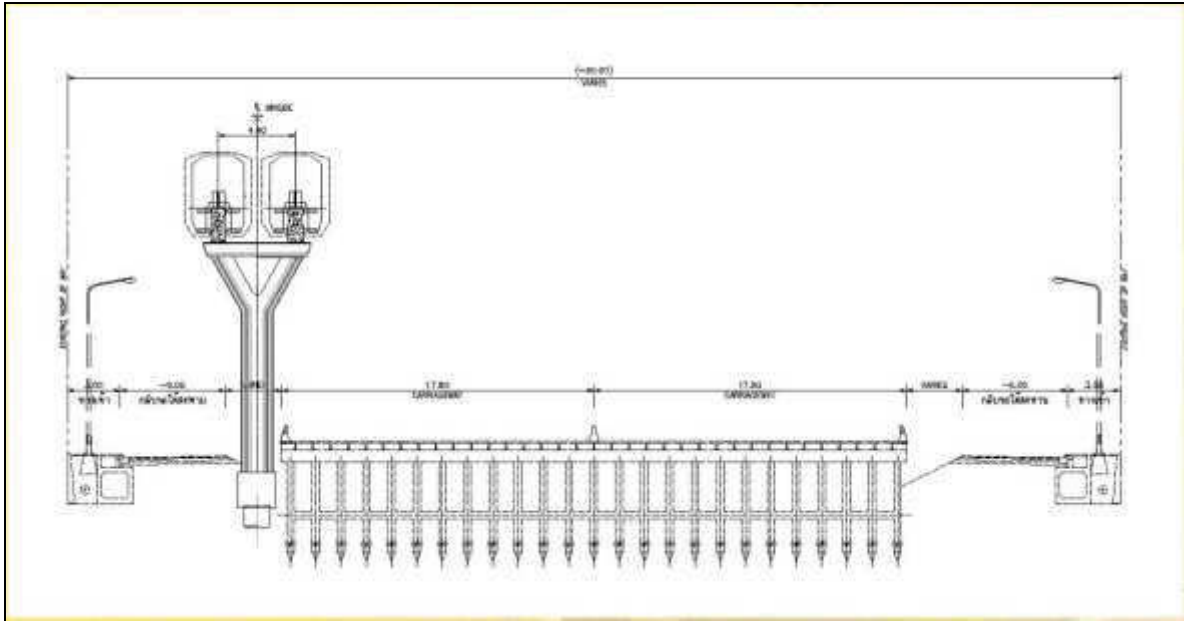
6 Cross section of road at Prawet Burirom Canal, 2<sup>nd</sup> Alternative
